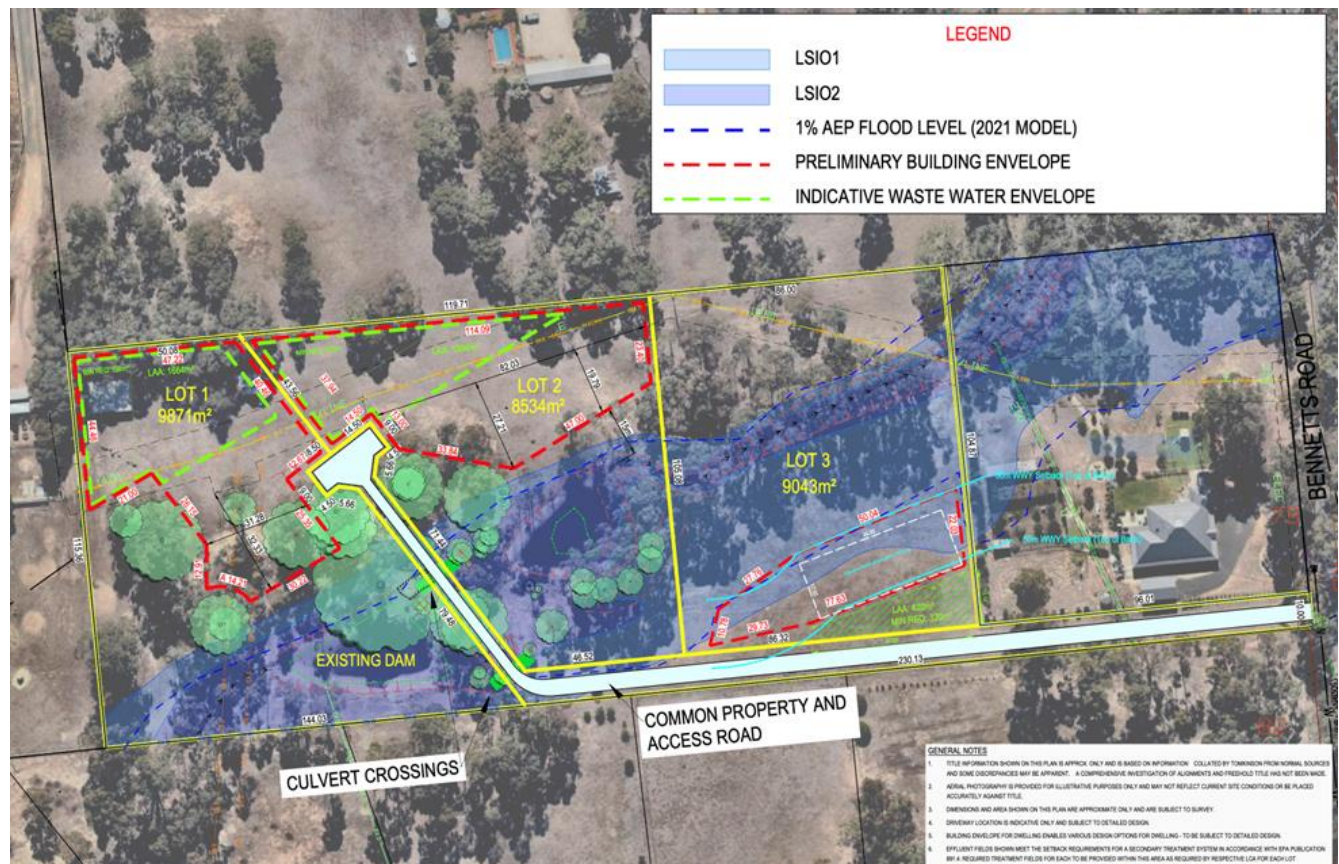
Extract from concept plan for proposed subdivision, indicating lots, building envelopes, and waste disposal fields.
